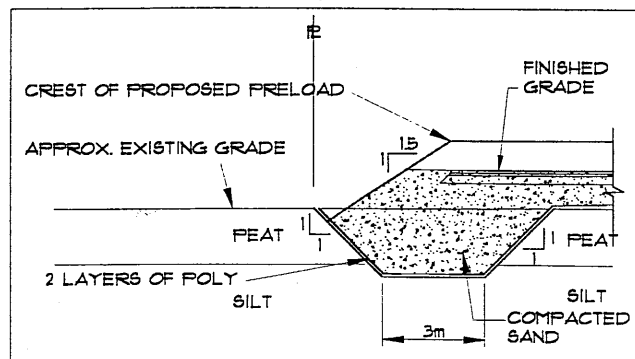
(Section 2, on fig. 2) Typical edge detail adjacent to neighbouring property.
